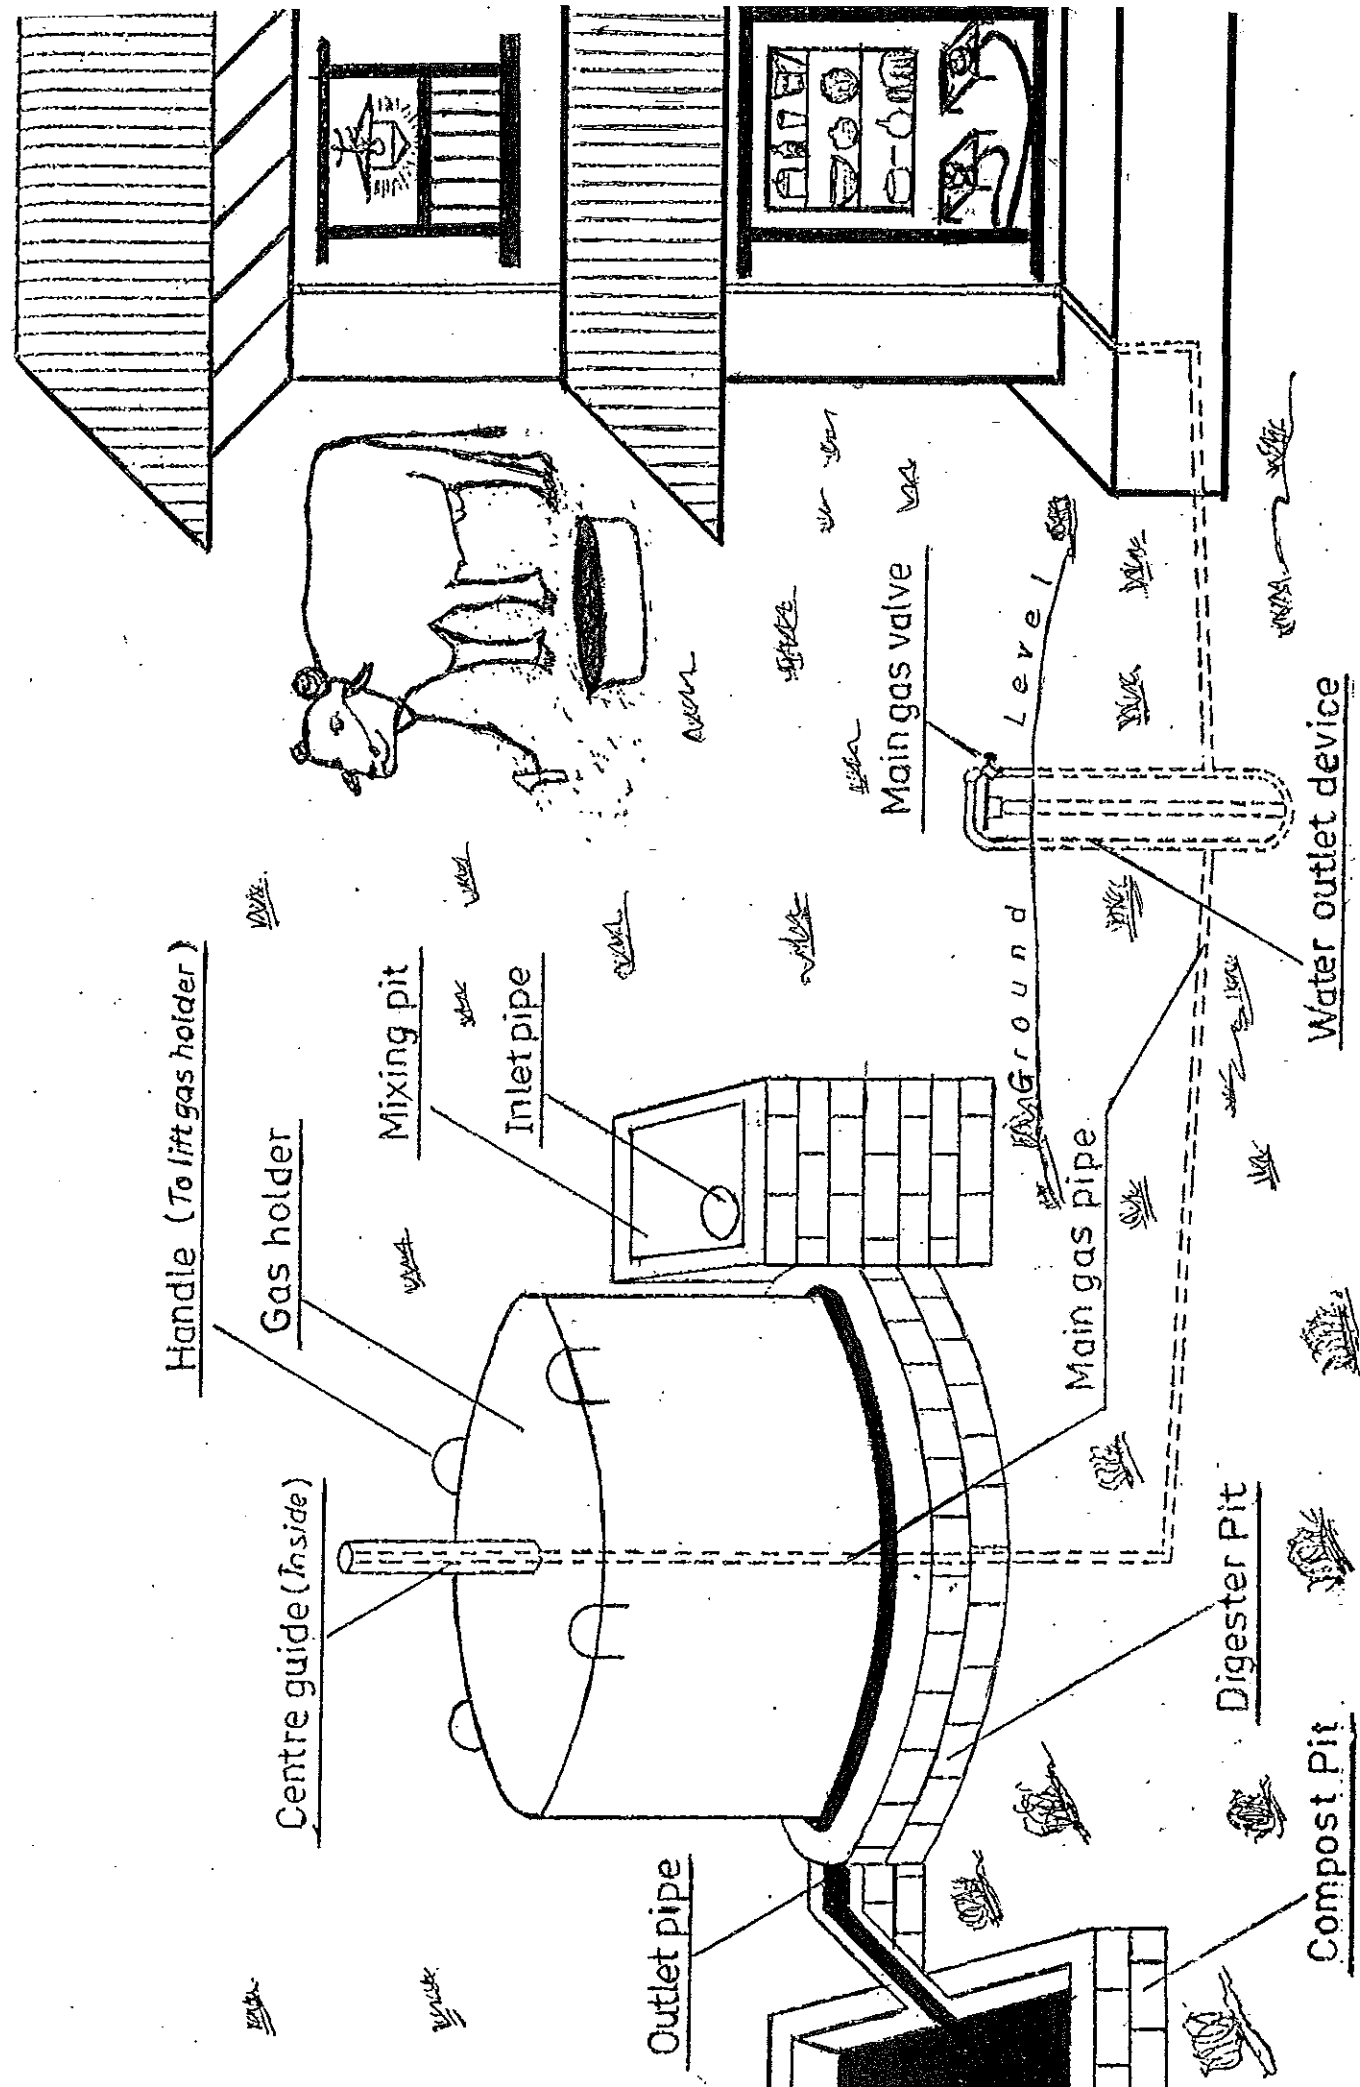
Floating Steel Drum Gas Plant (Janak Nepal)
